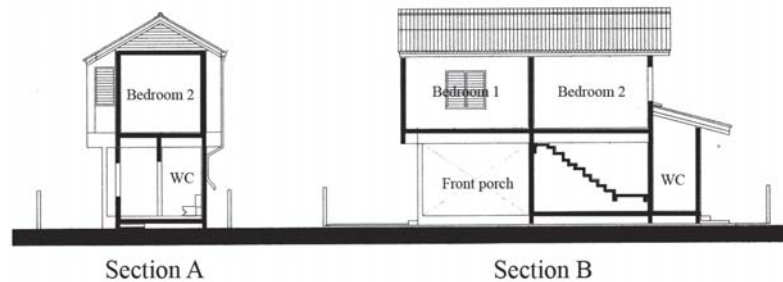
Section A & B of typical Baan Ua-arthorn house.
